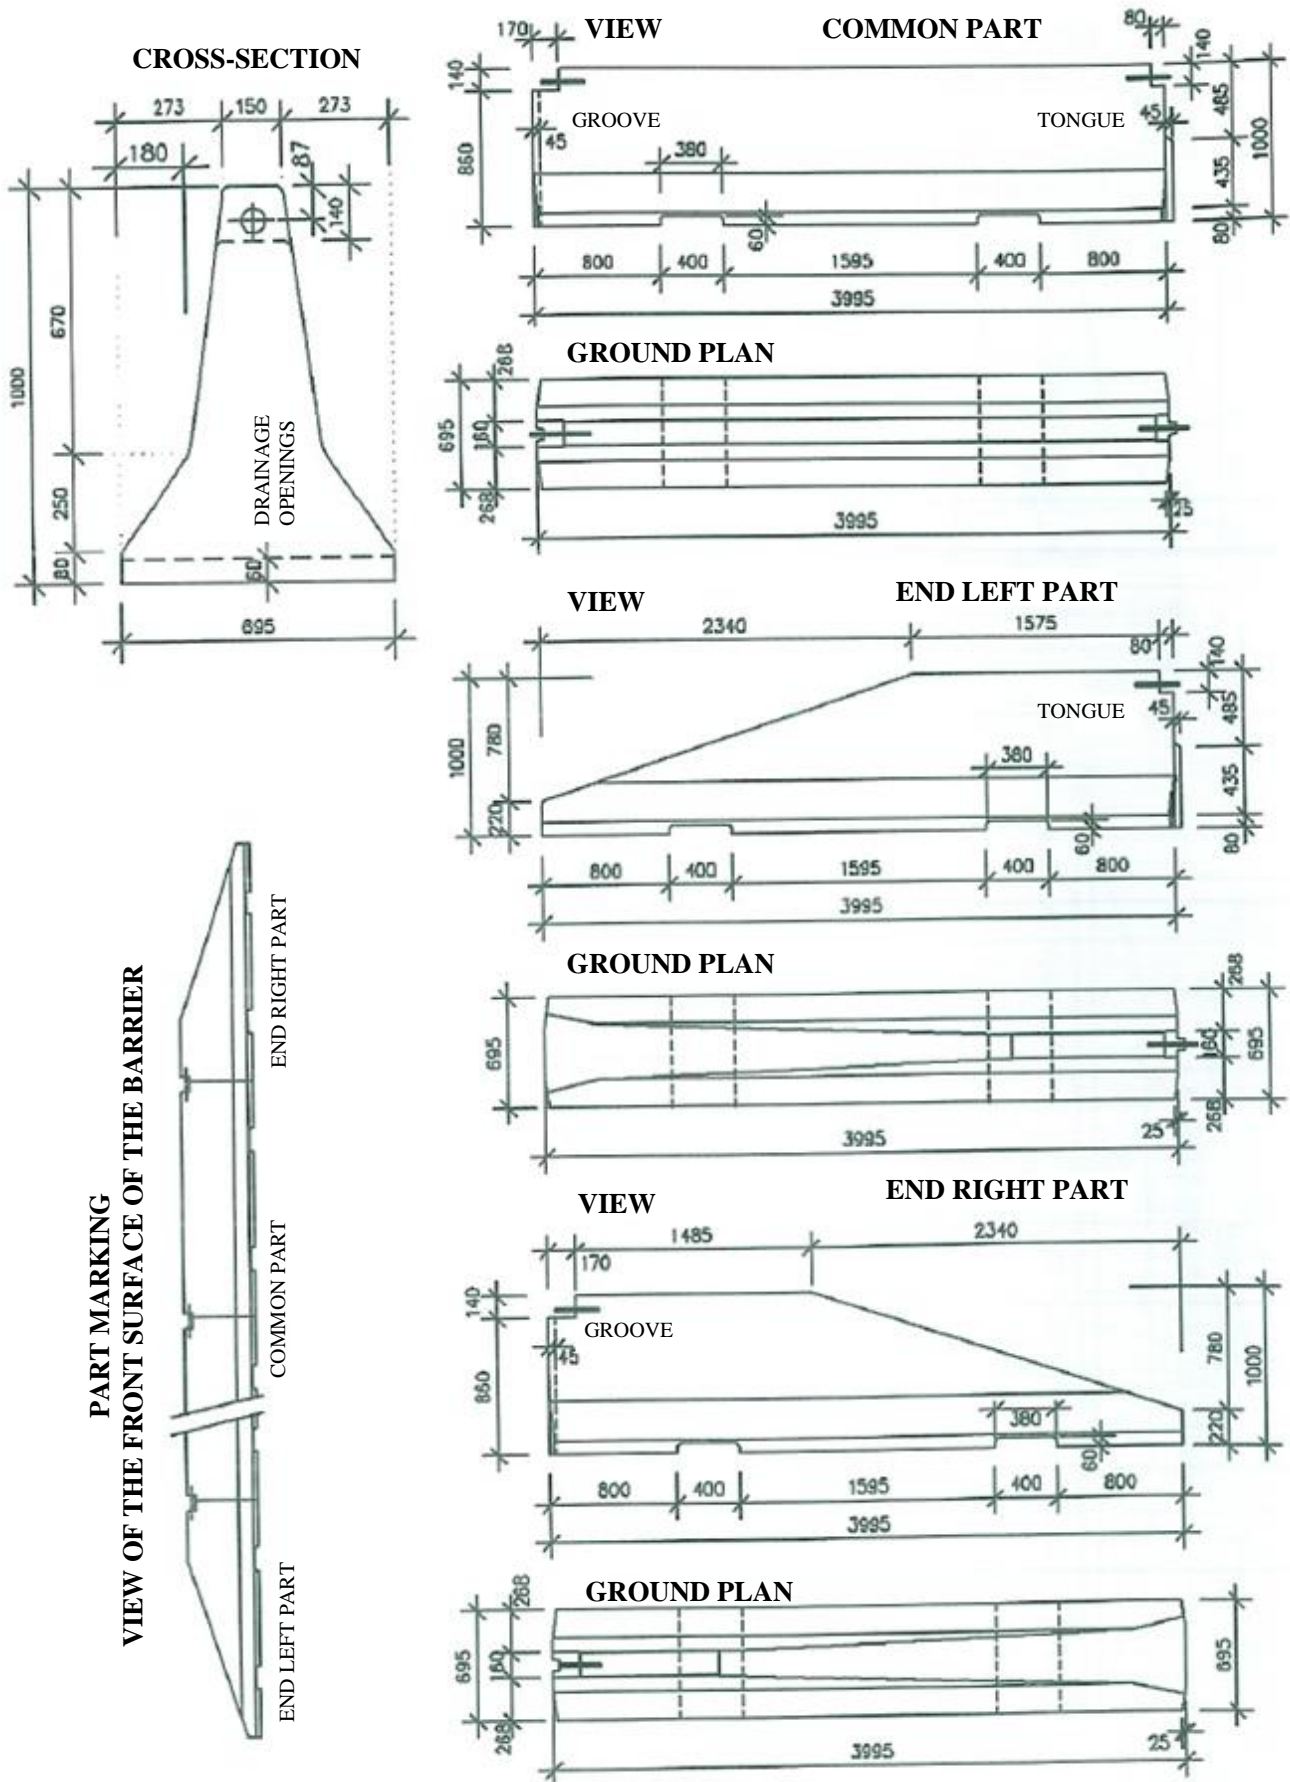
Double sided concrete barrier 1 m height – common and end part
